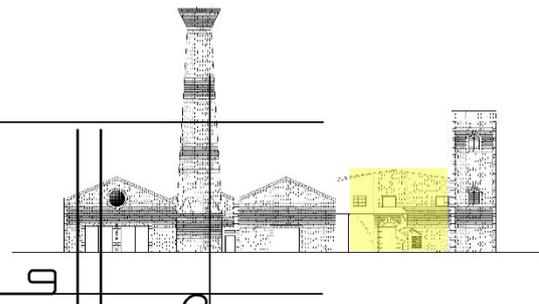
Termite Infestation - Wooden doors, windows on Barrack A and its extension, North-west Elevation, 15 to 17A, East Wharf, KPT, Karachi.
